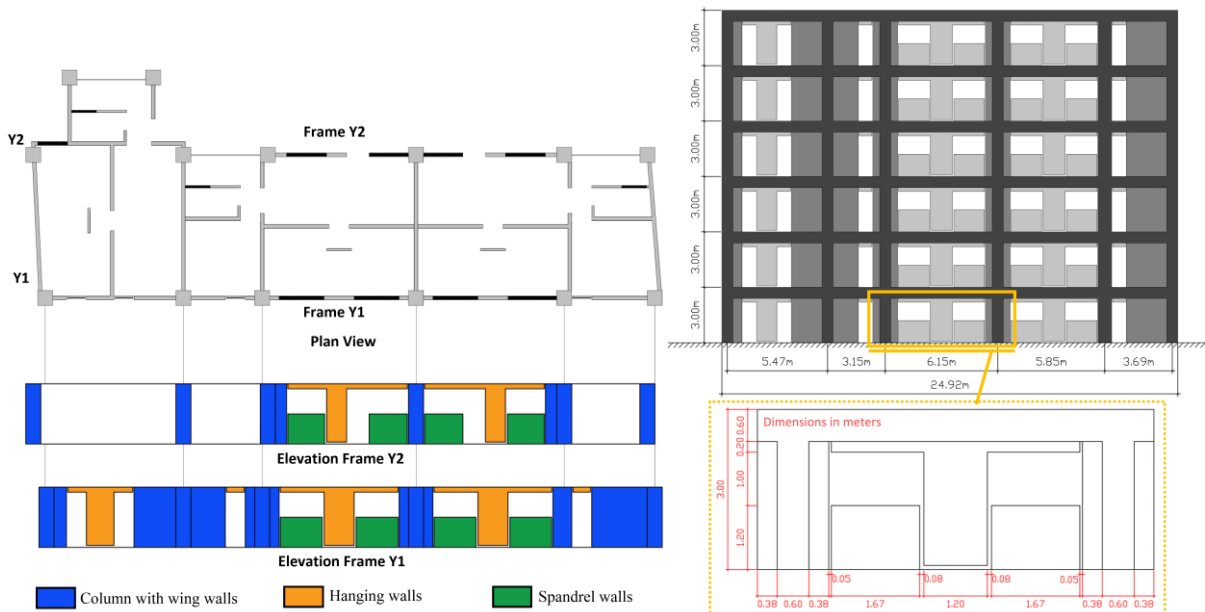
Plan view and elevation view of Target Building. Moment-resisting frame with wall elements and non-structural walls.
